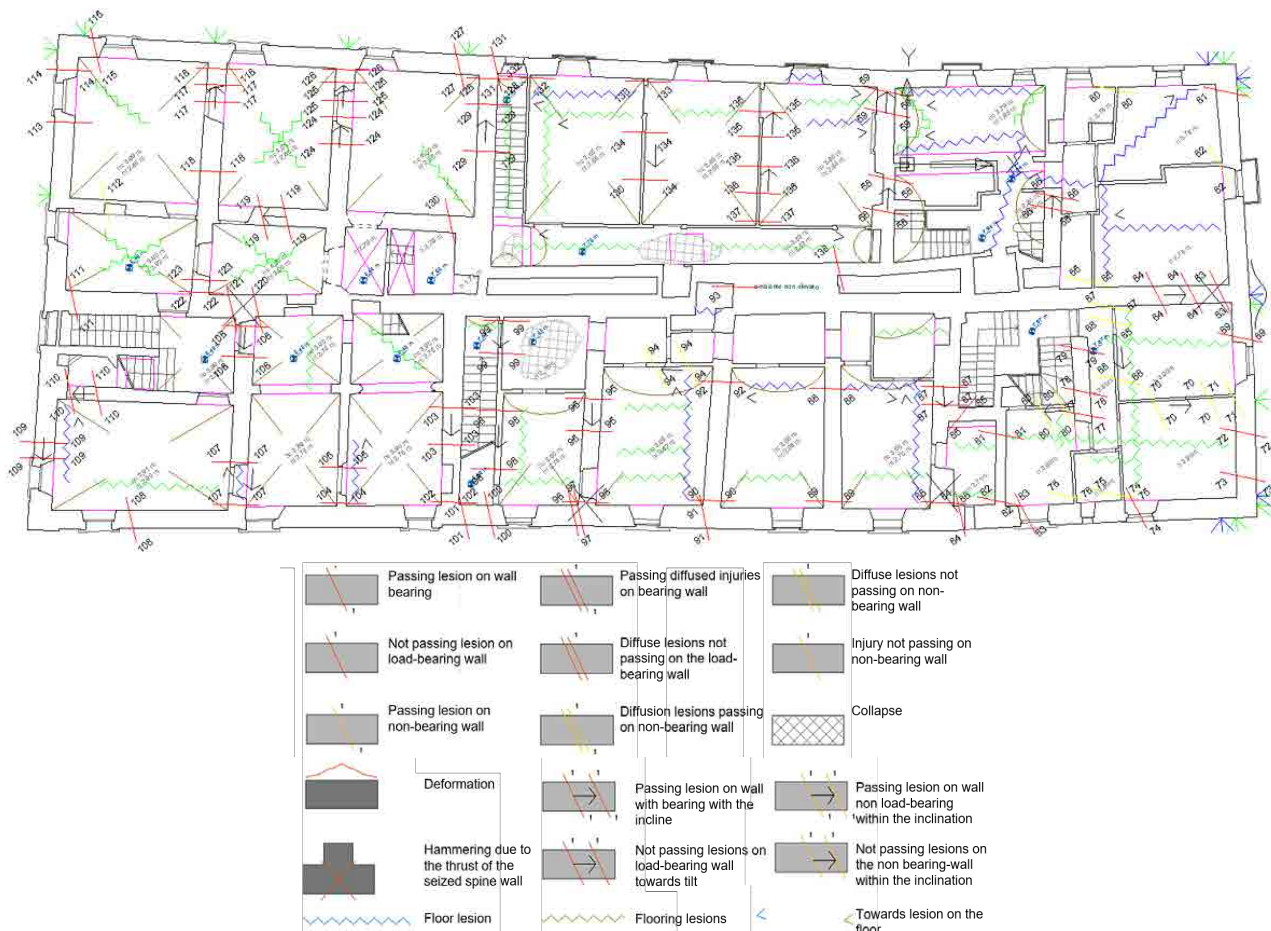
Plan. Horizontal section and physical damage legend. Redesigned by Susana Mora.
